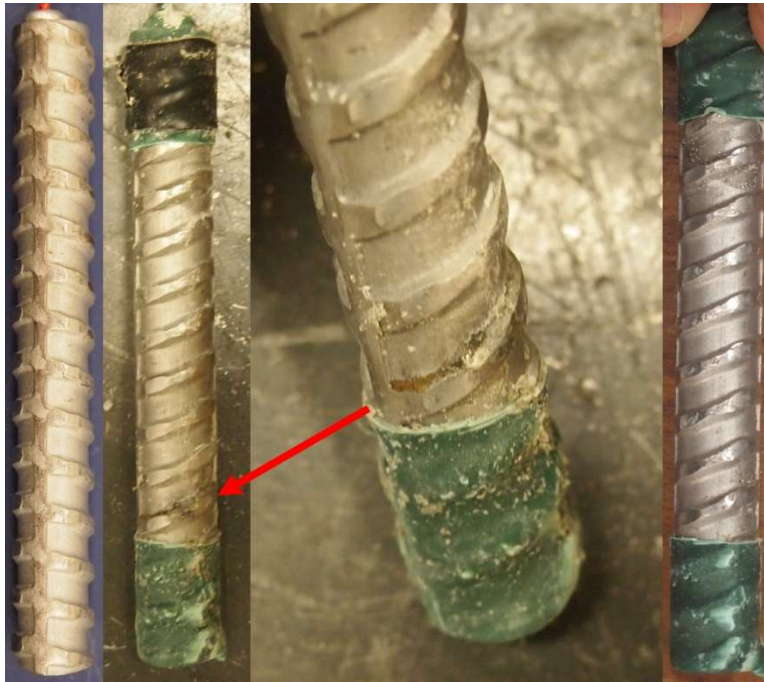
RST 7.5-300 Batch – XM-28 AR 7.4 Corrosion Products Cracking the Concrete Specimen
